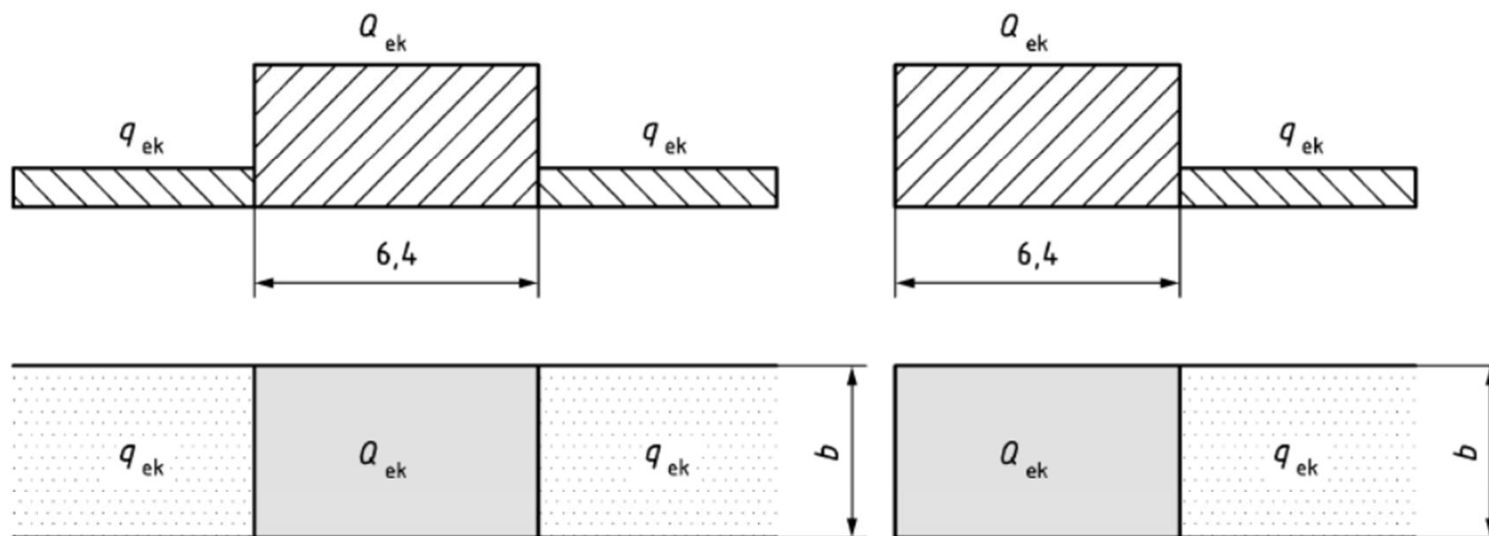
Equivalent load arrangement for Load Model 71 for geotechnical structures
